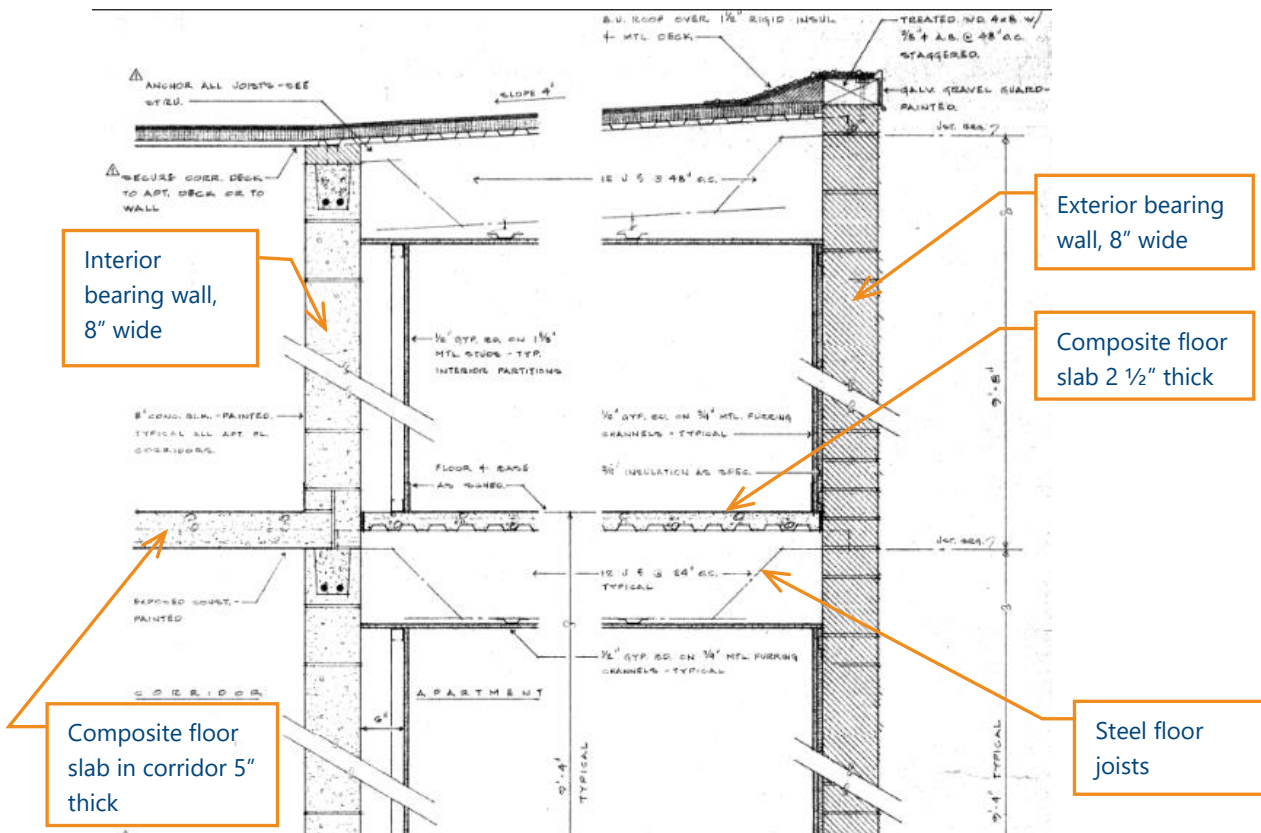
Section (north-south direction) through the exterior and interior bearing walls
